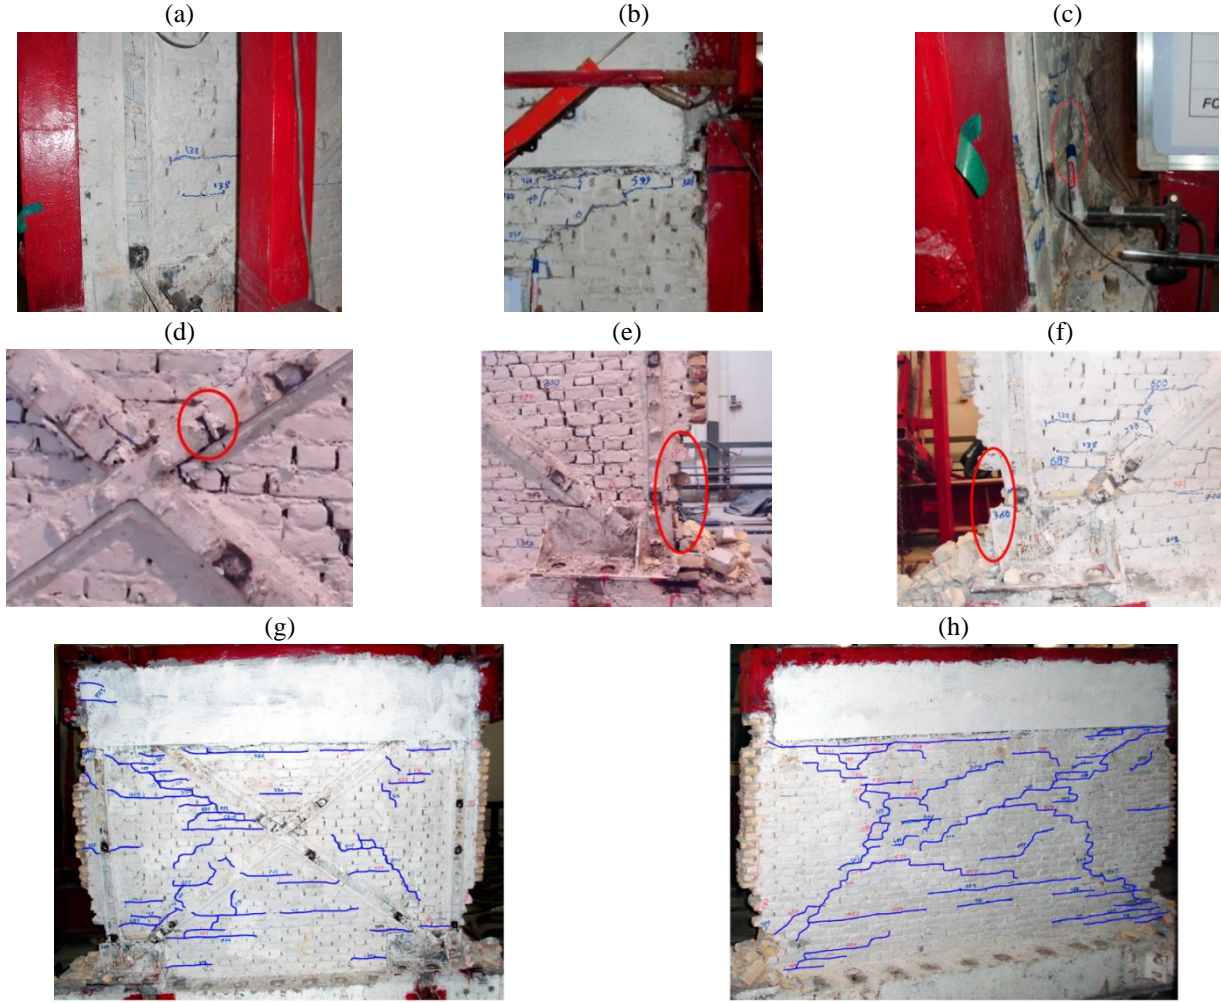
Damage and crack patterns of Specimen EMW21SSR-4. (a) Horizontal crack, (b) Width of vertical crack, (c) local buckling of steel strip, (d) fracture of steel strip, (e) and (f) toe crushing, (g) Retrofitted surface end of test and (h) Unretrofitted surface end of test
